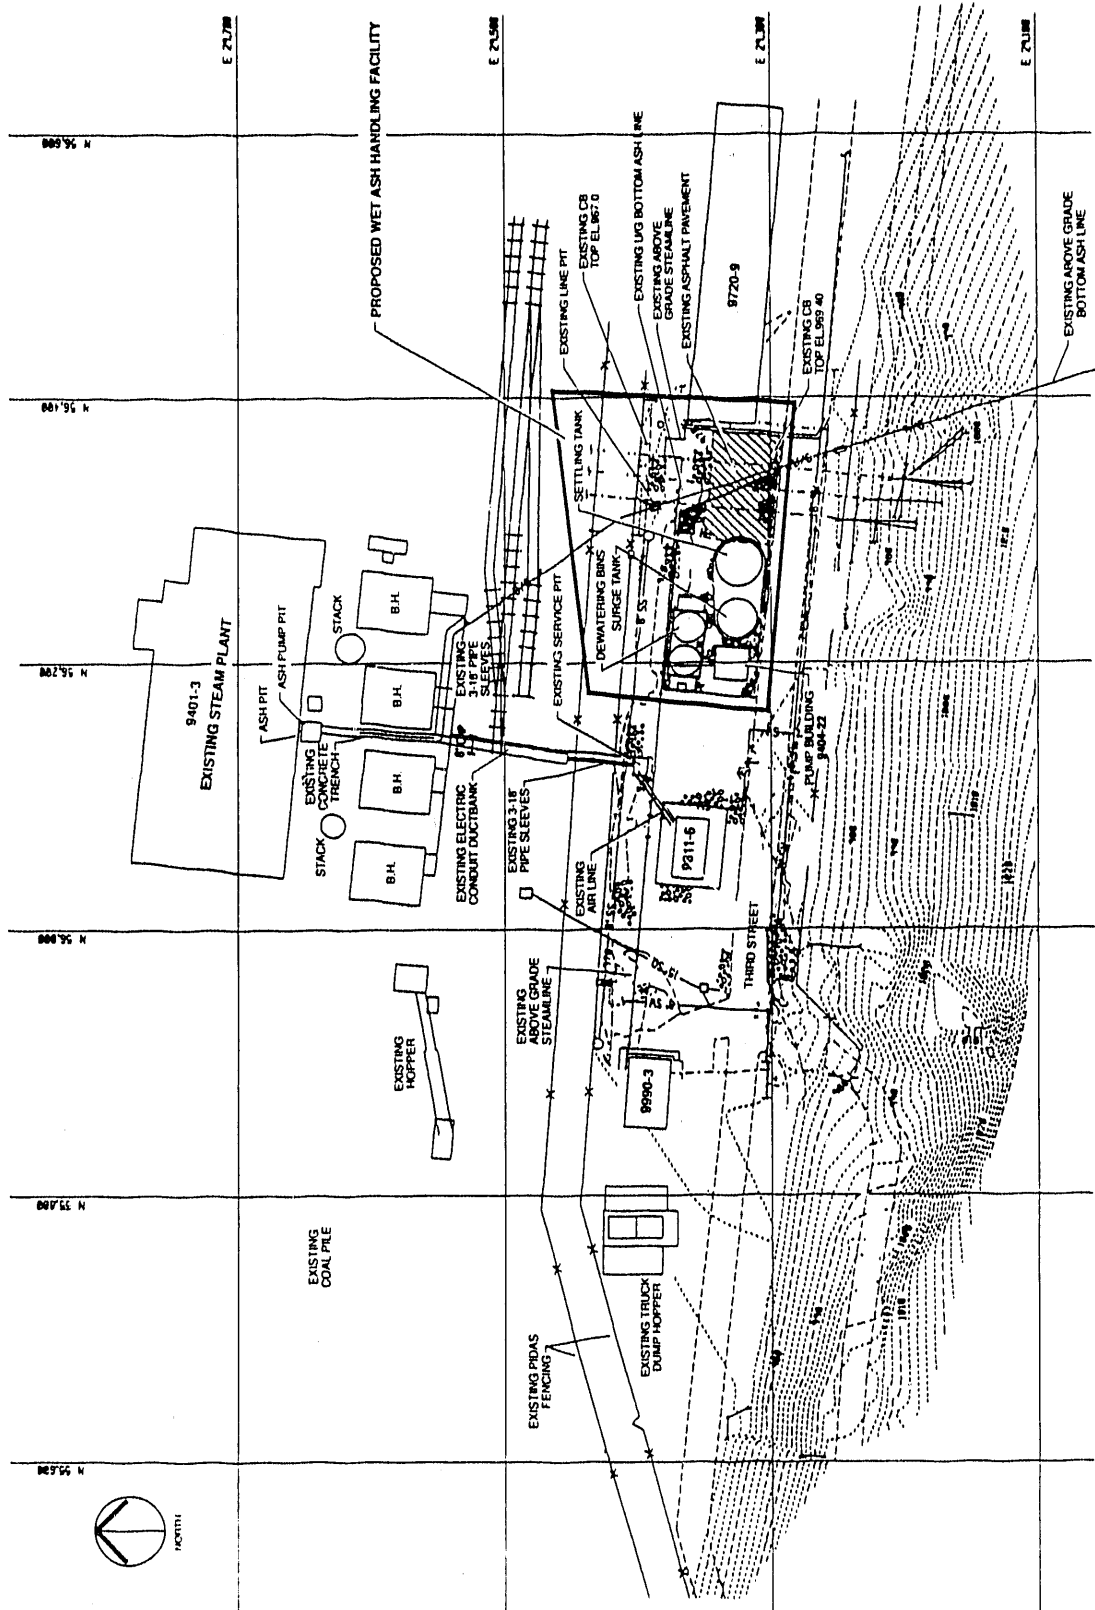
Location of the proposed wet ash handling facility site in relation to Building 9401-3 on the Y-12 Plant site.
